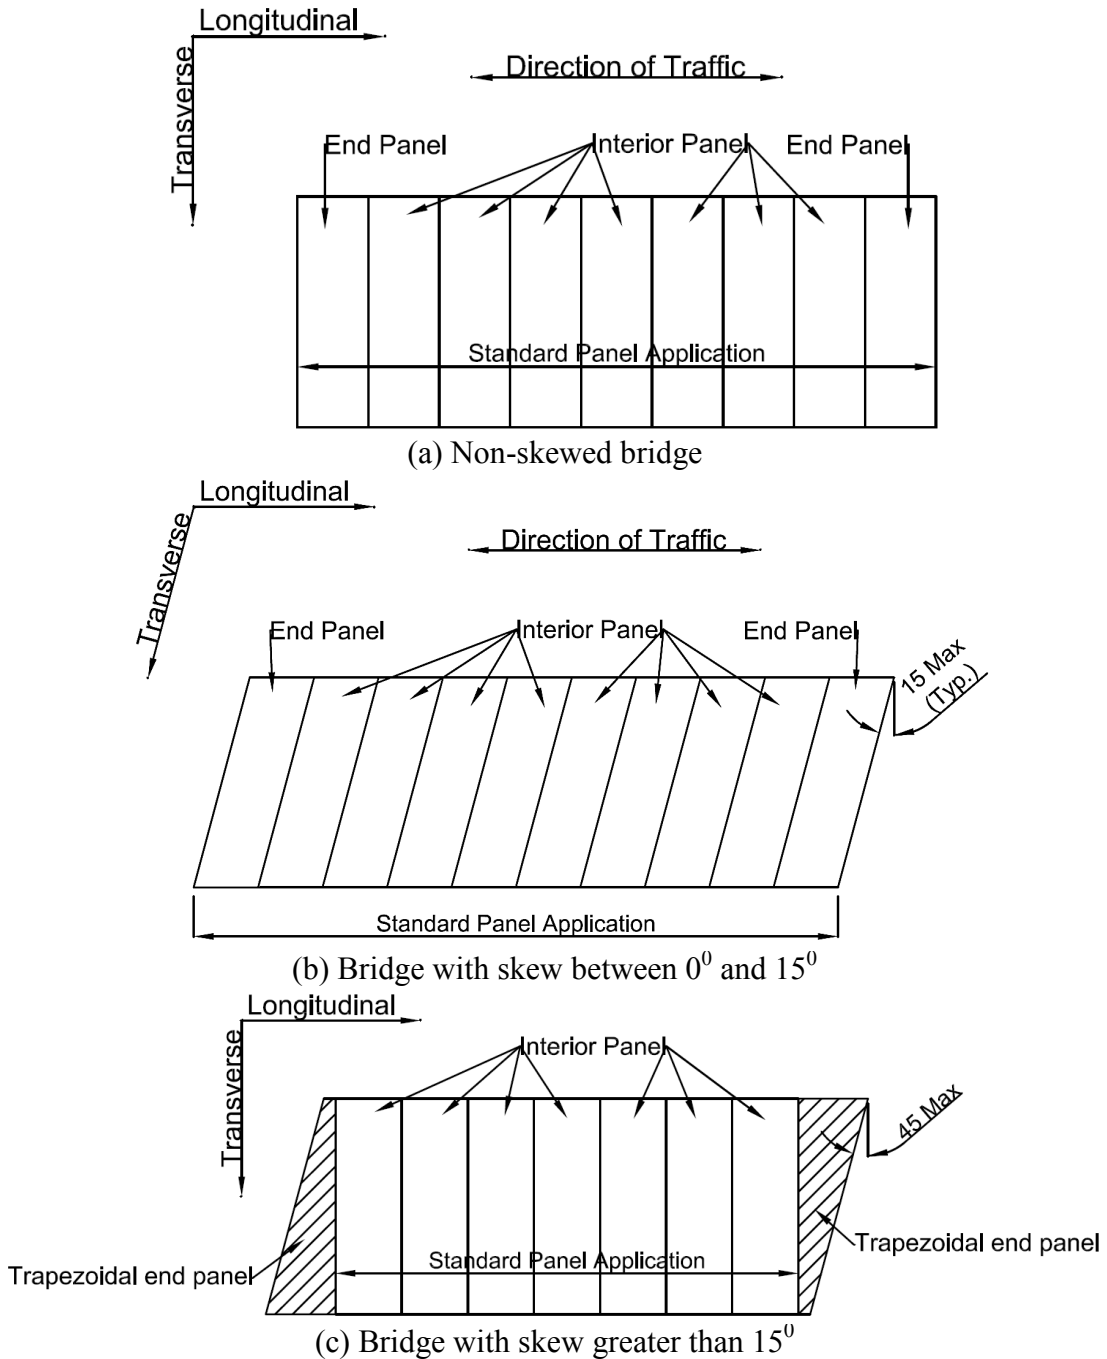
Standard full-depth deck panel applications (Source: UDOT 2010b)
